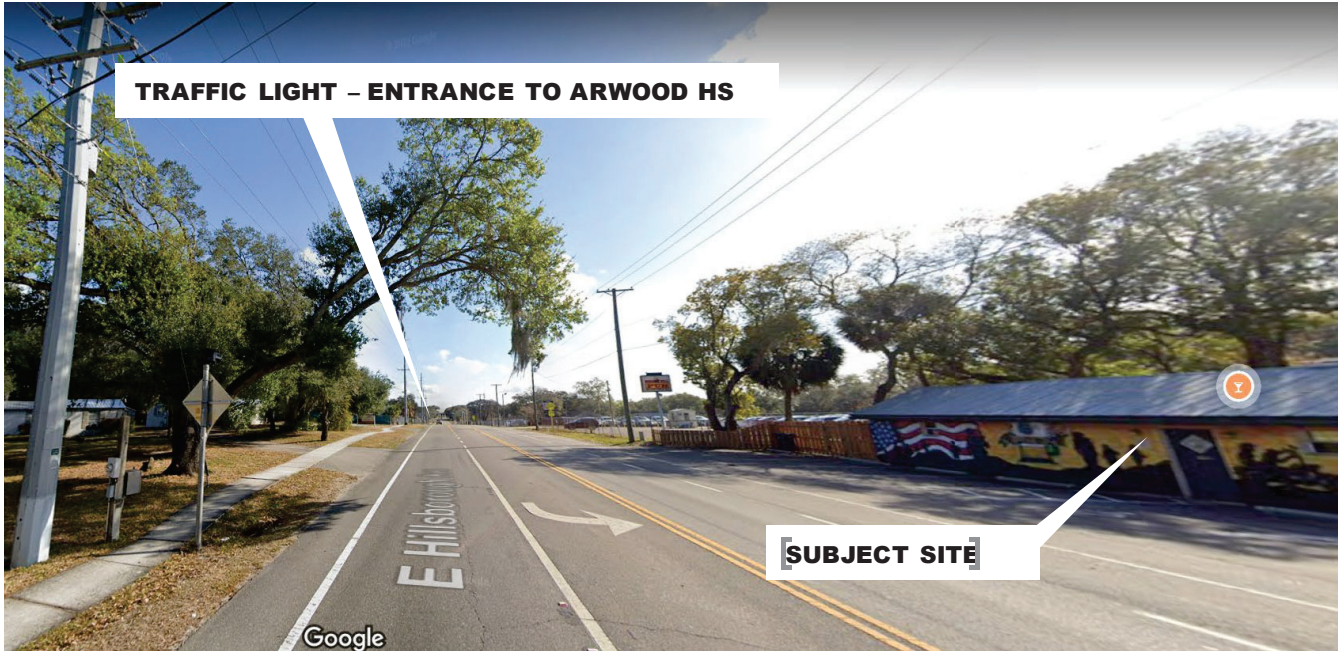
View of site and U.S. Highway 92 (looking east) separating the proposed wet zone site from the Armwood HS.
